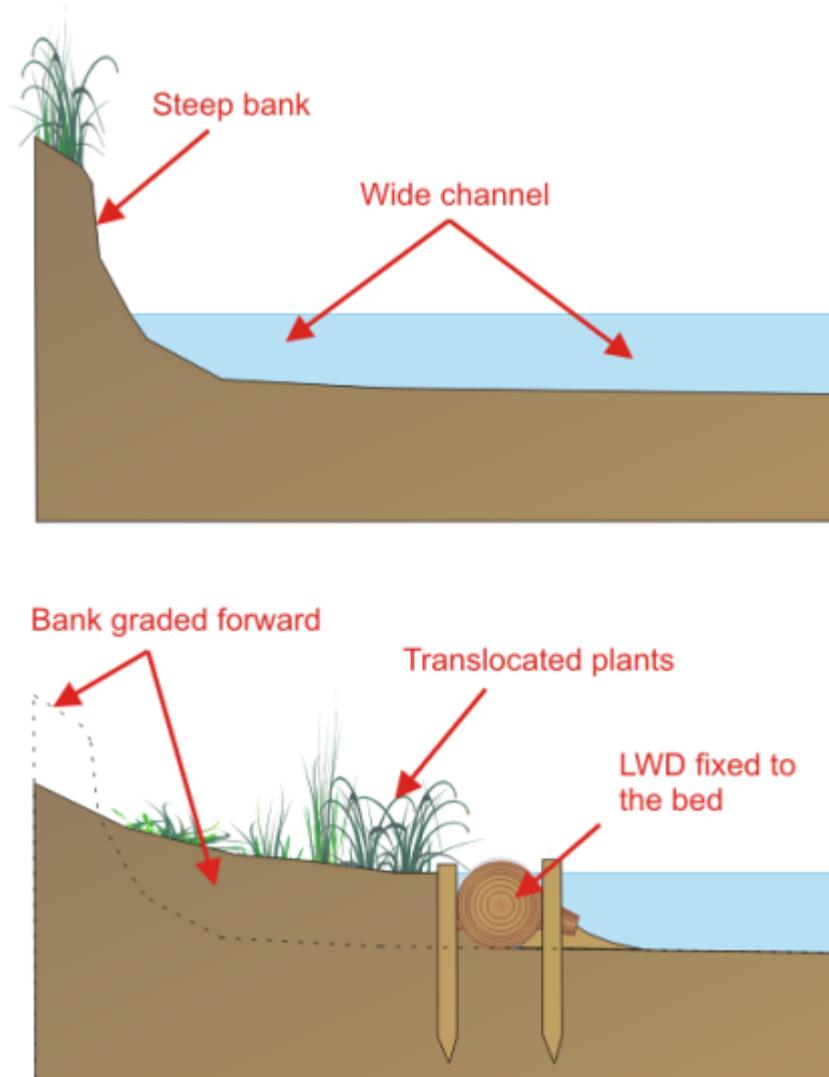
Example bank re-grading works to narrow the channel and provide better angling access
